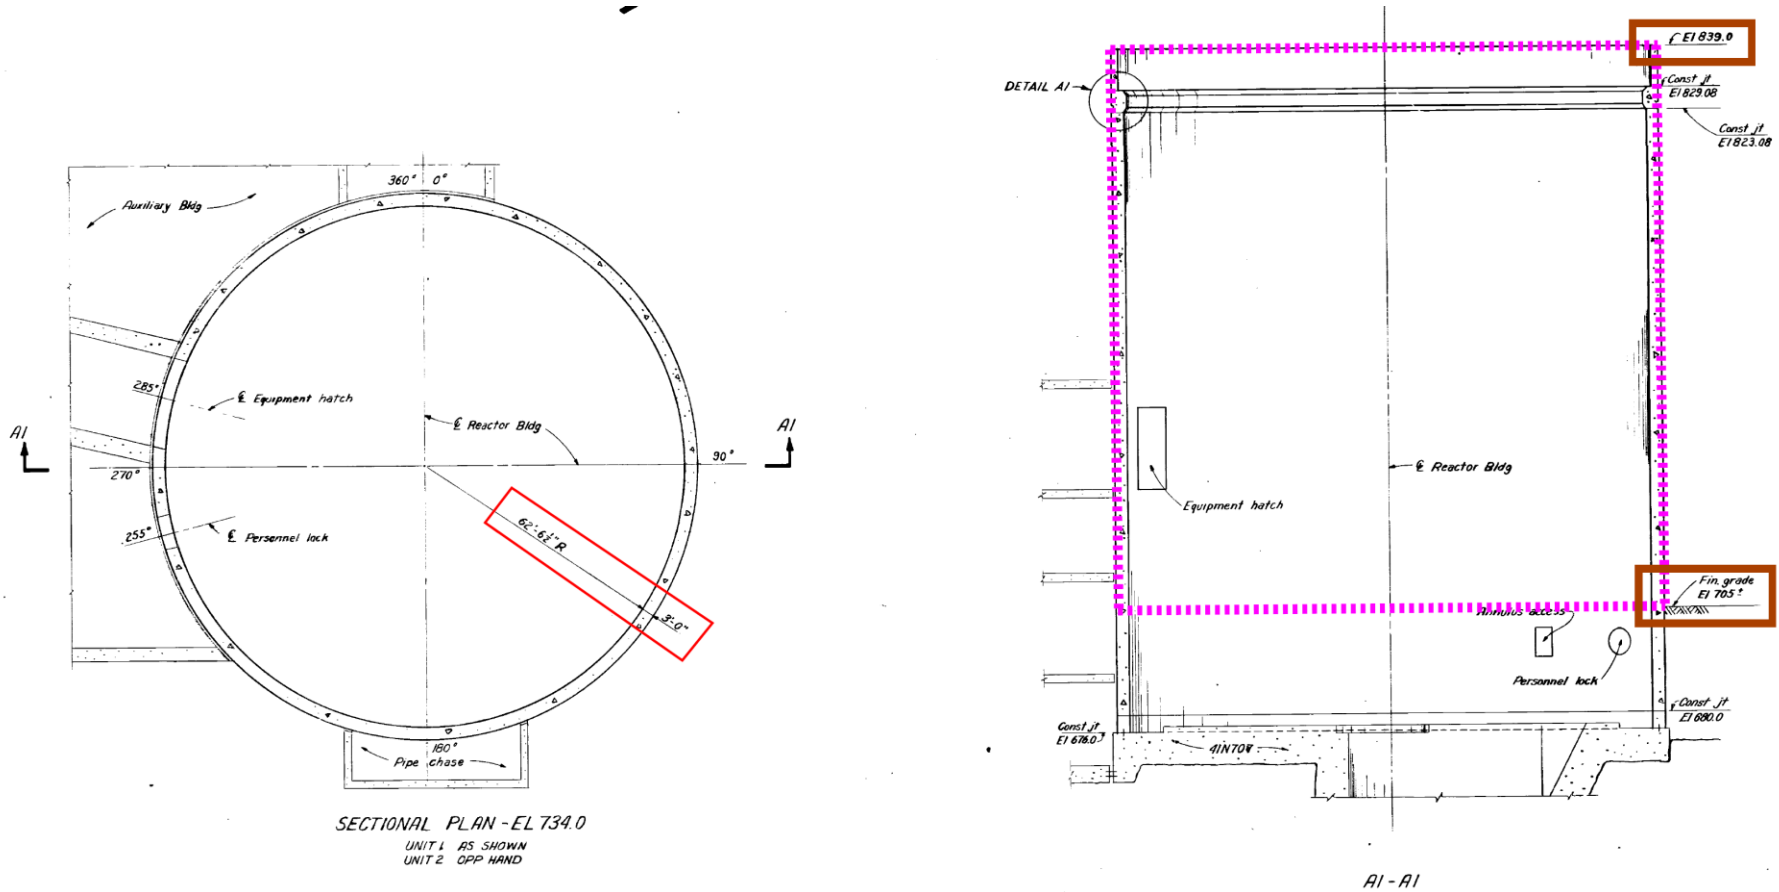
Containment Building Area – Cylindrical Building Projection
